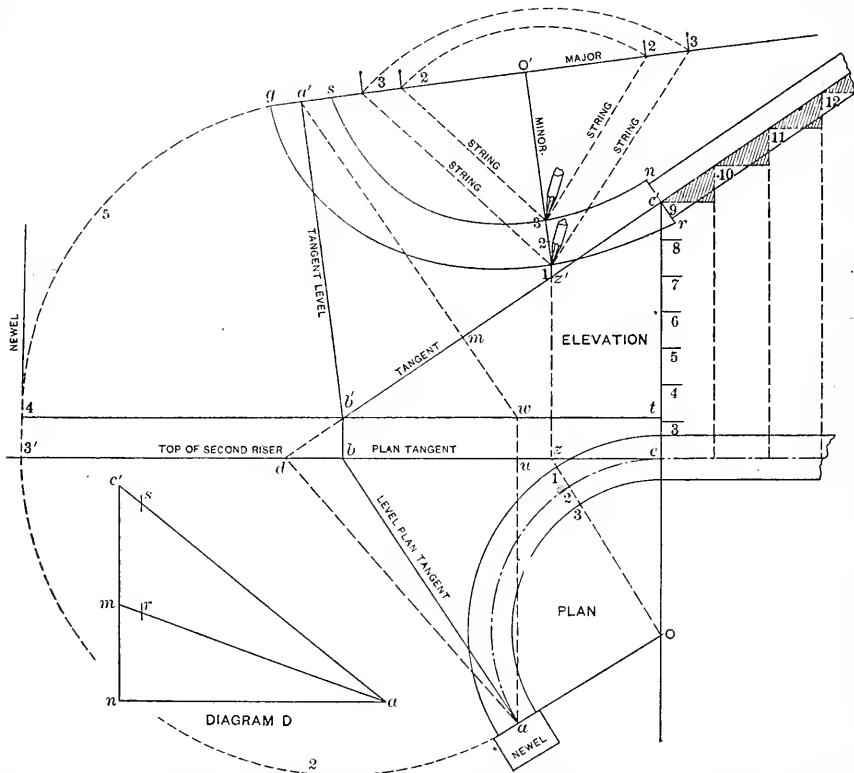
Plan, Elevation and Face Mold of the Stretchout Rail at the Starting of the Stairway Shown in the Previous Figure.
